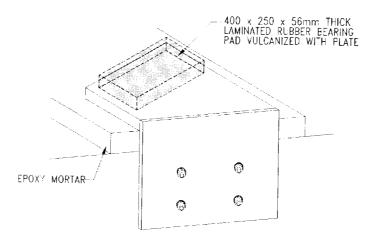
Isometric View of Complete Component of Elastomeric Bearing Pad
